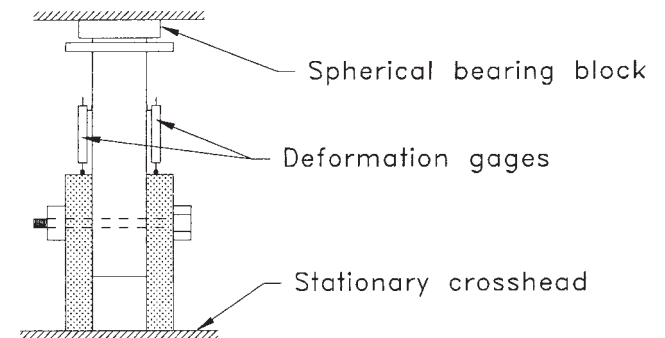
Assembly for Testing Bolted Connections Parallel to Grain in Compression
